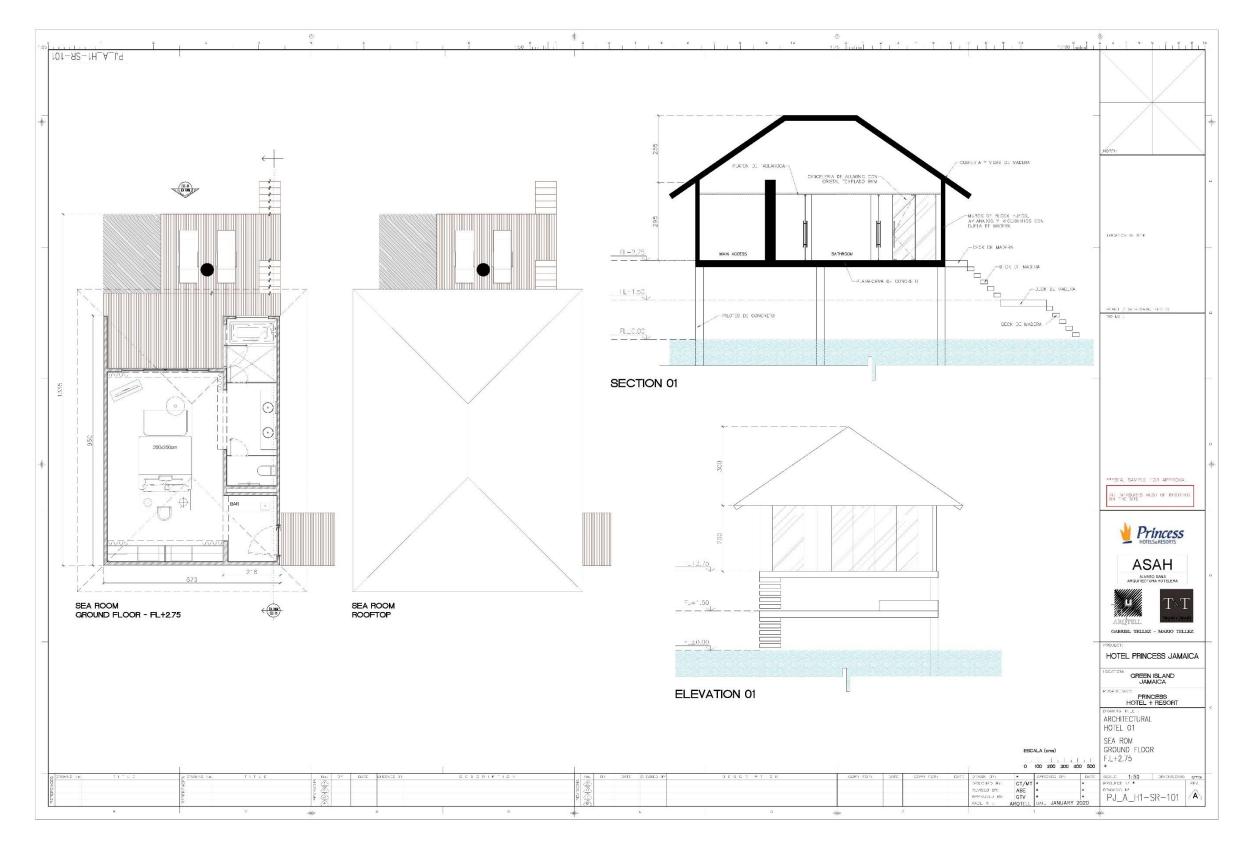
Plan View and Cross Sections of the Overwater Sea Rooms
